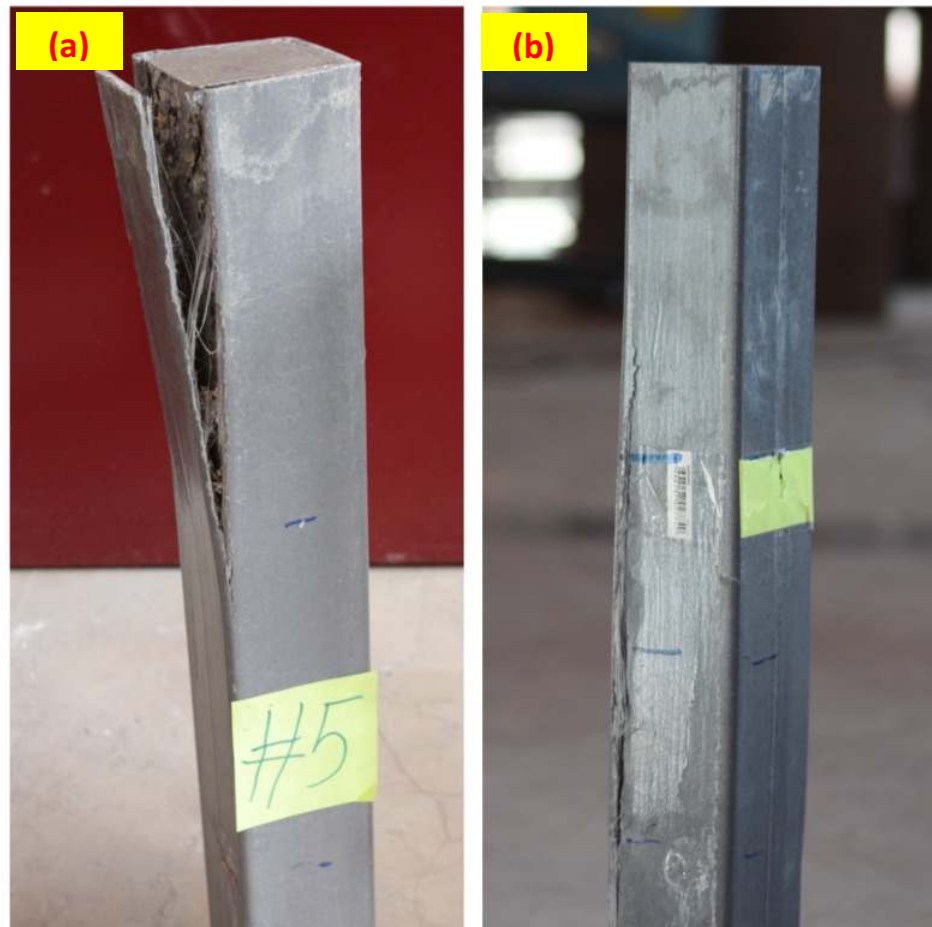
(a)- Outward rupture in filled specimen, (b)-Inward failure in empty specimen
